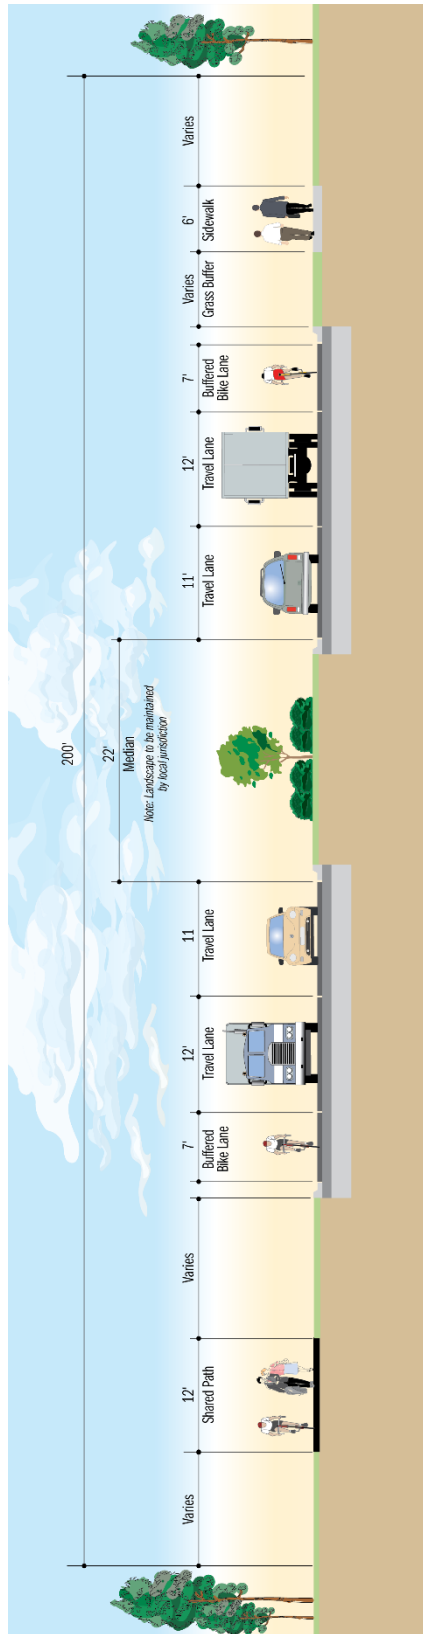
Segment 3 – Cox Road to Coventry Court Typical Section
